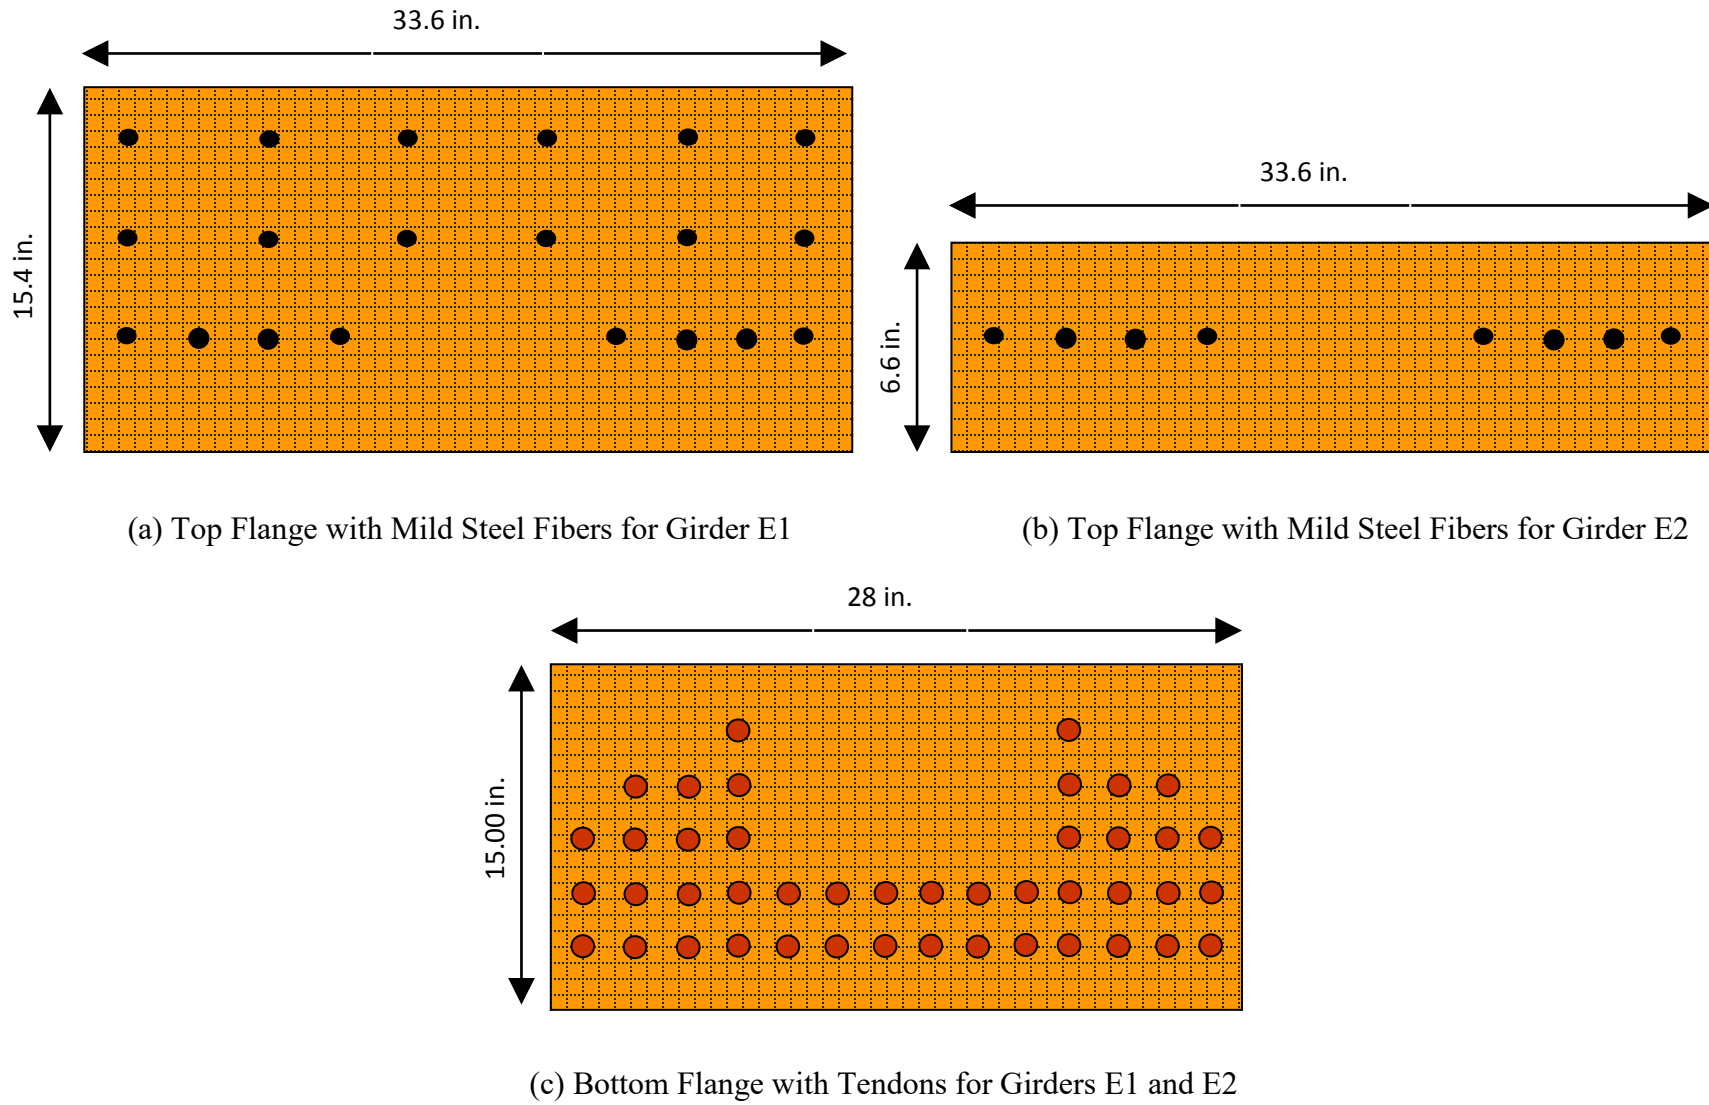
Section Discretization of NonlinearBeamColumn Elements for Girder Specimens E1 and E2
